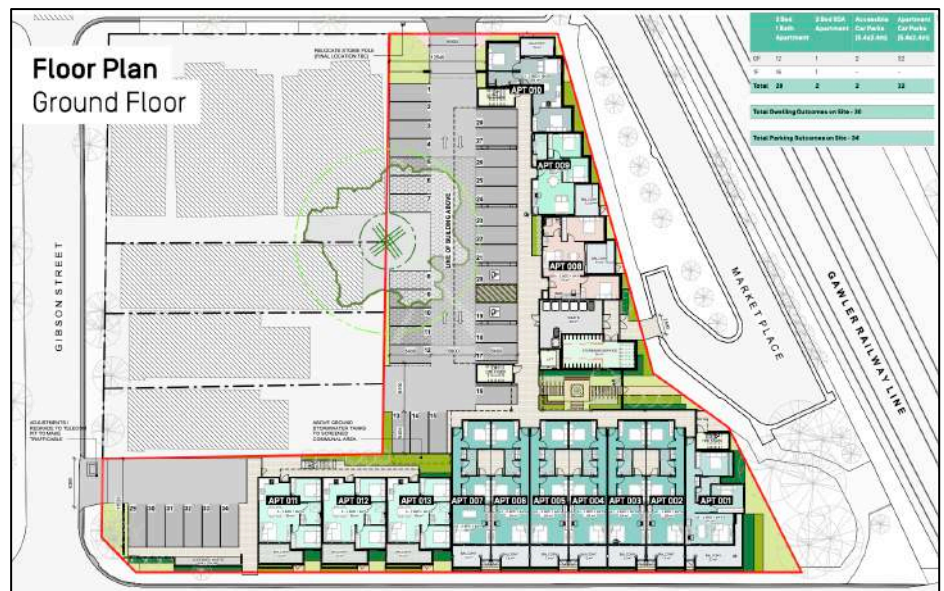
Ground floor layout of site [Source: City Collective 2024]
